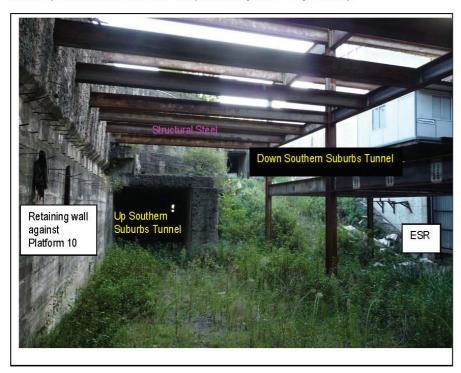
Void between Platform 10 and Eastern Suburbs Railway looking towards Sydney
